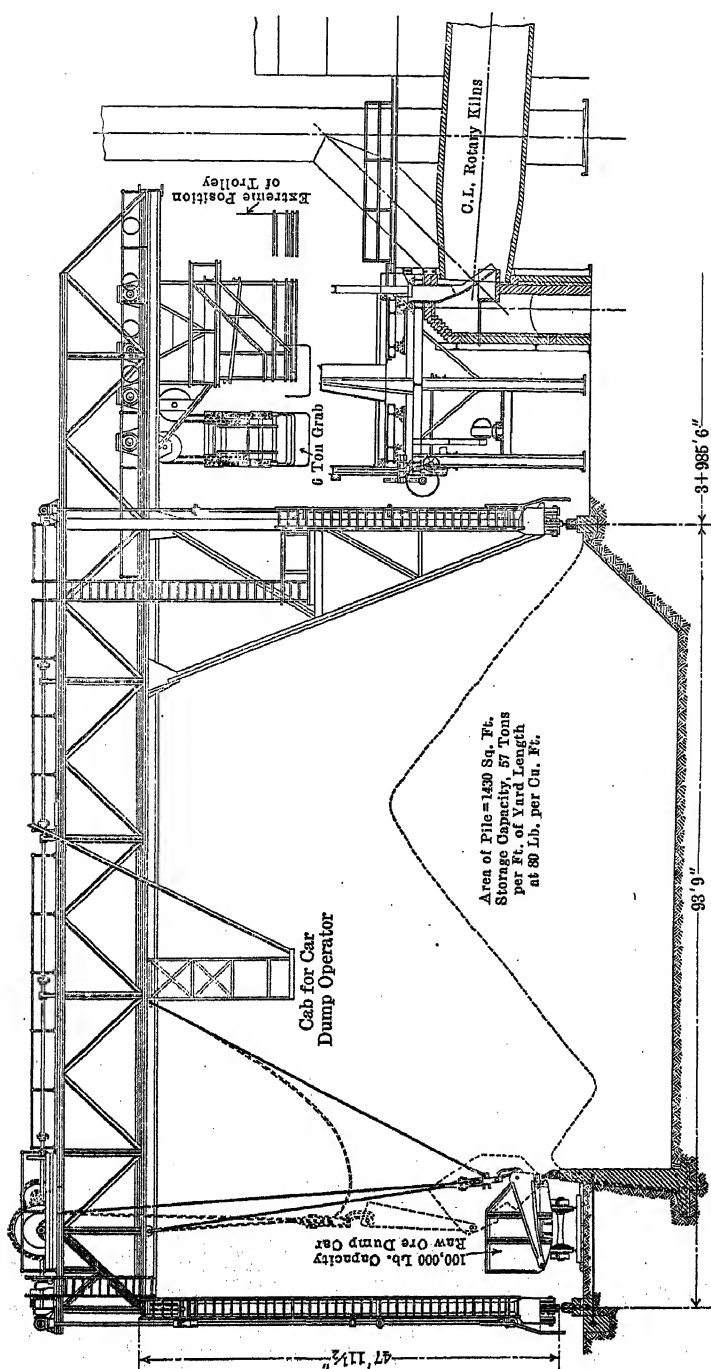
SECTION THROUGH RAW-ORE YARD AND FEED-END OF KILNS (LOOKING SOUTH).
